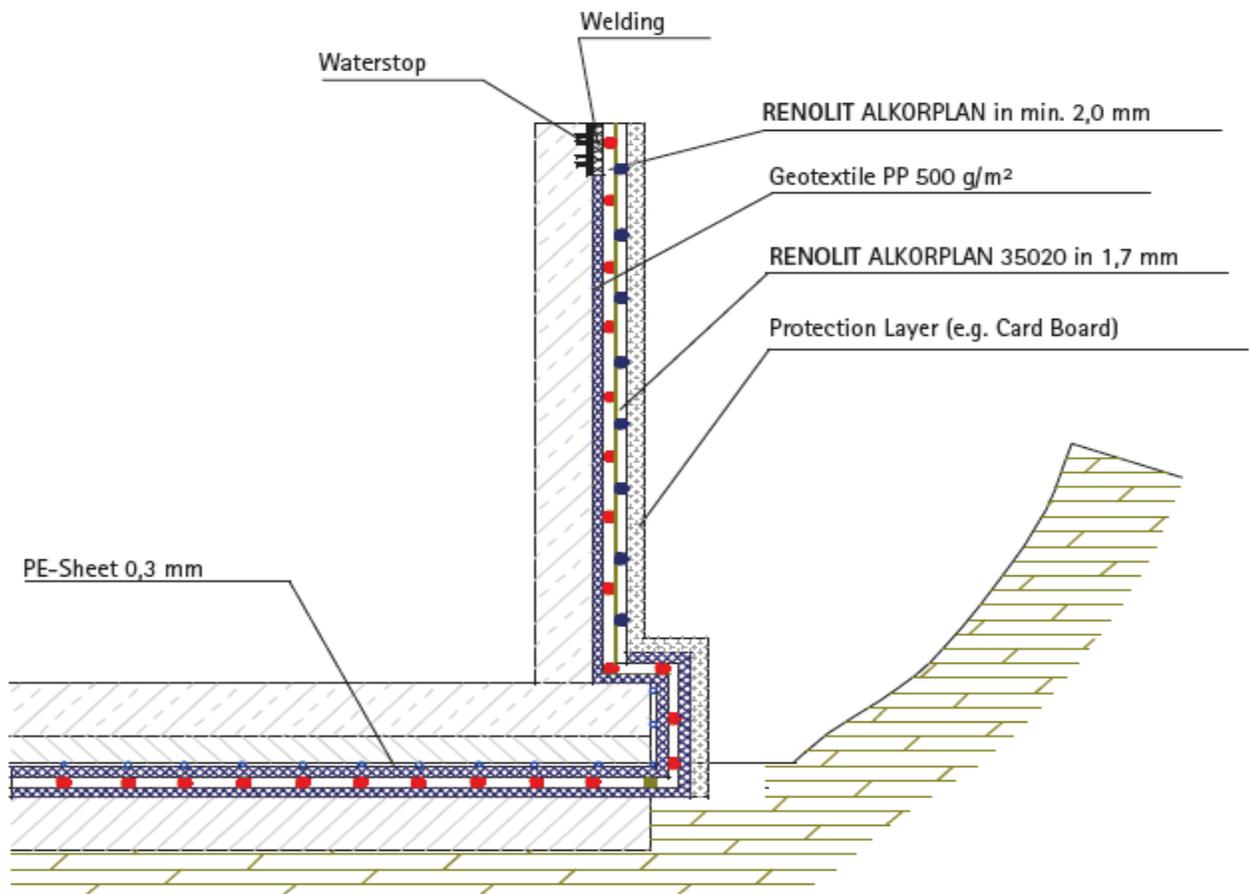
Waterproofing of the vertical wall with working space<sup>[16]</sup>
